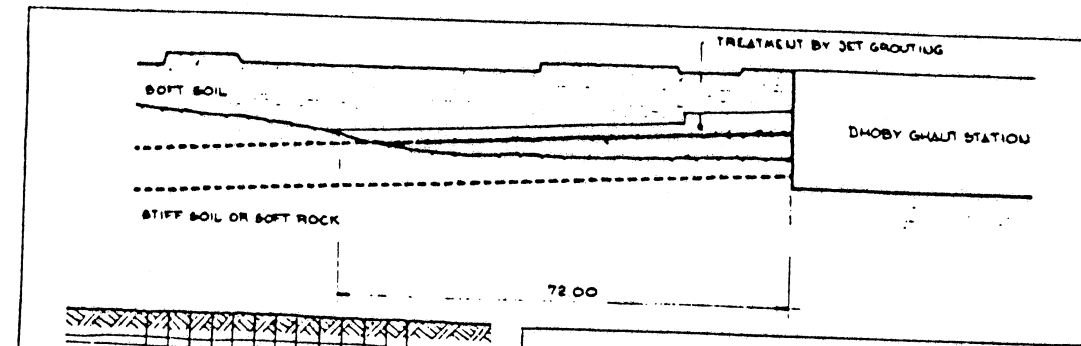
Jet Grouted Blocks for Tunnel Excavation, Contract 106, Singapore MRT, (after Lunardi, et al., 1986).
